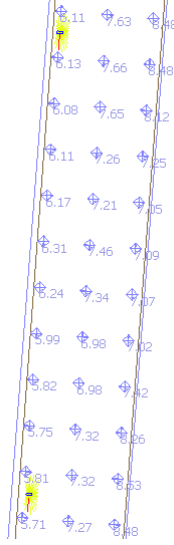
Measuring Grid of a stretch of road towards laser building
